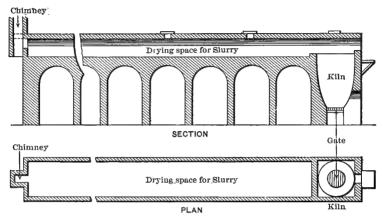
Plan and section of Johnson kiln. (Engineering News.)
